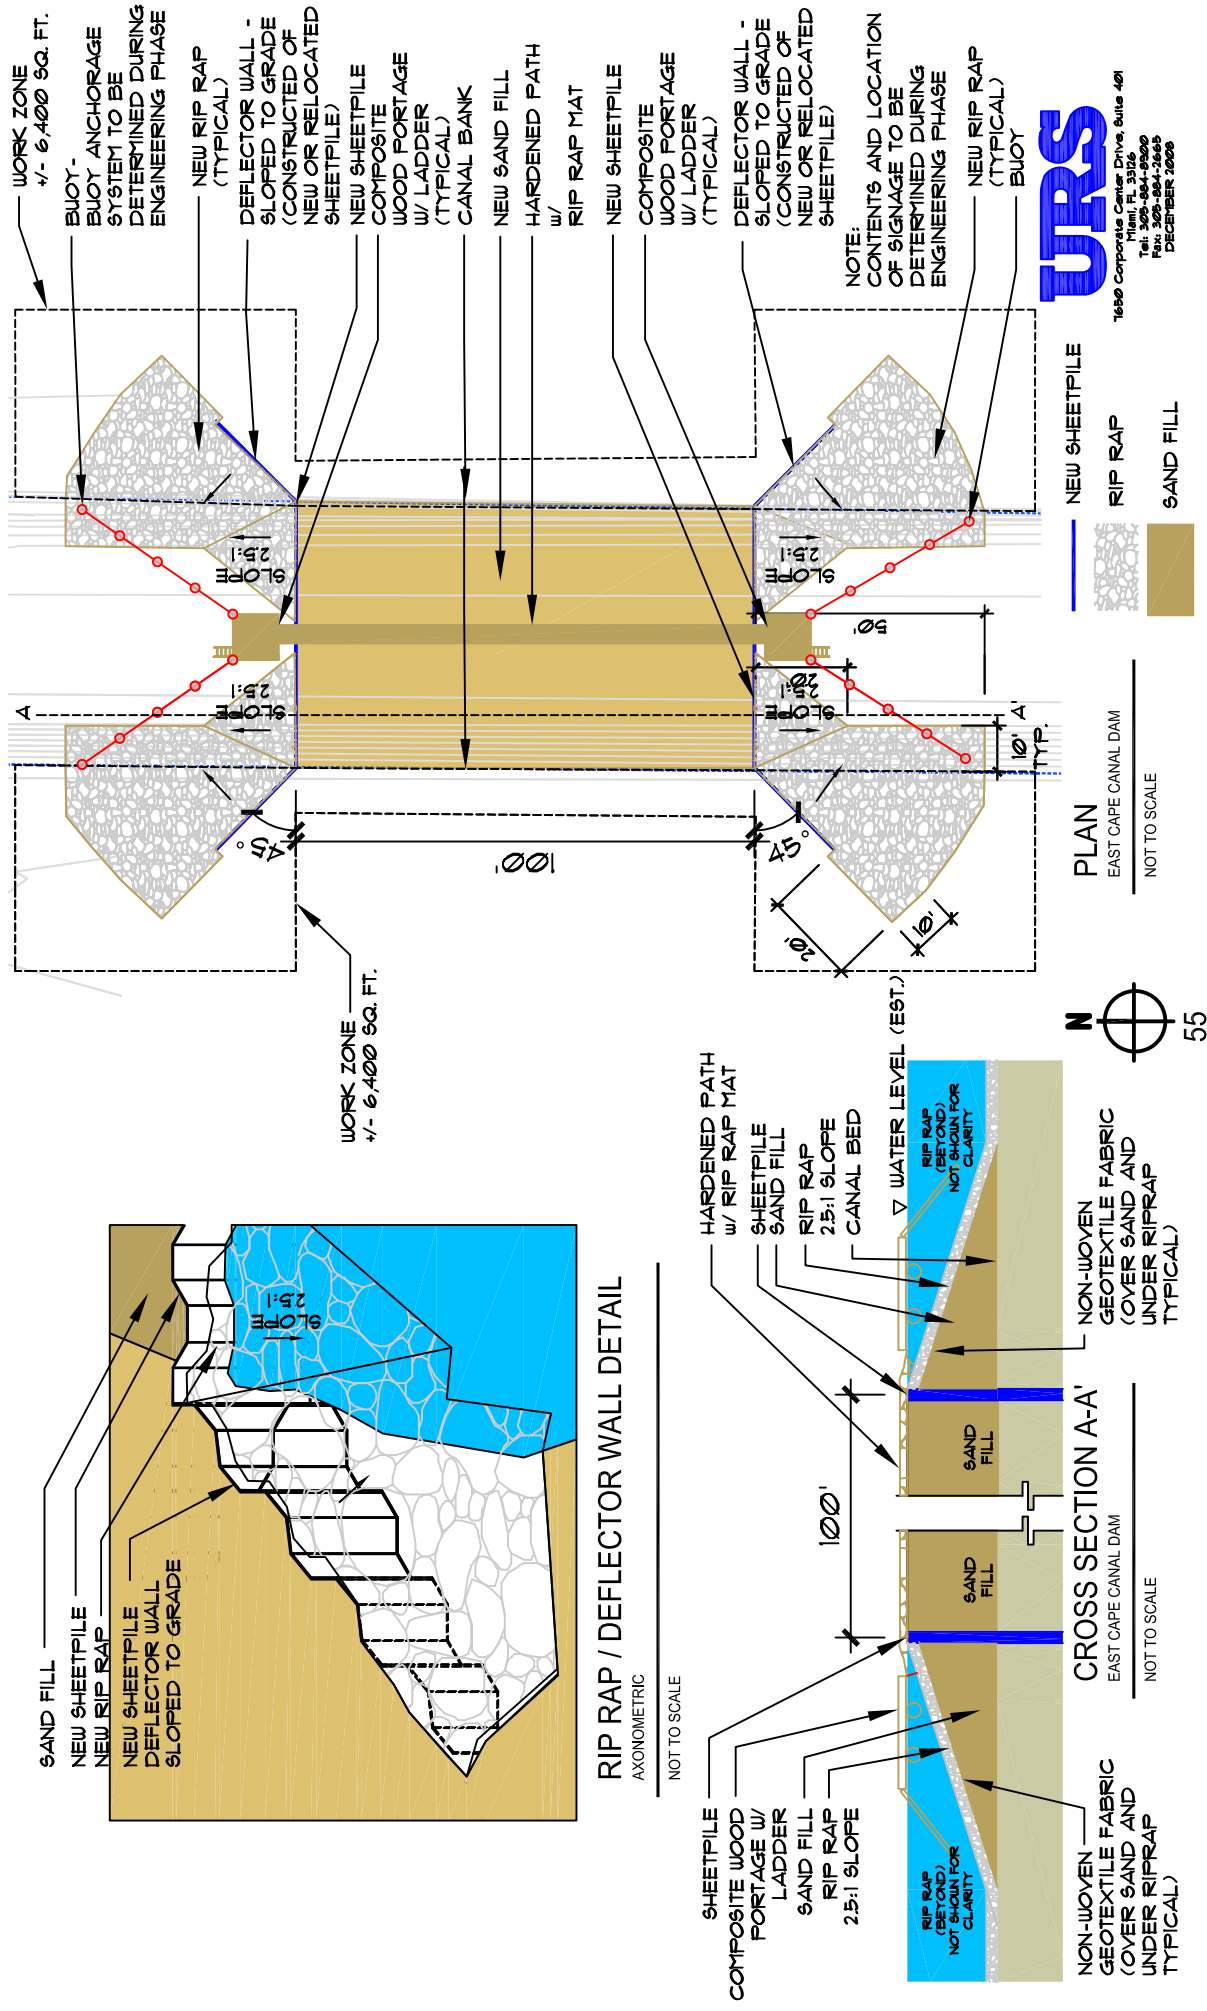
EAST CAPE EXTENSION CANAL DAM - ALTERNATIVE G DRAWING
